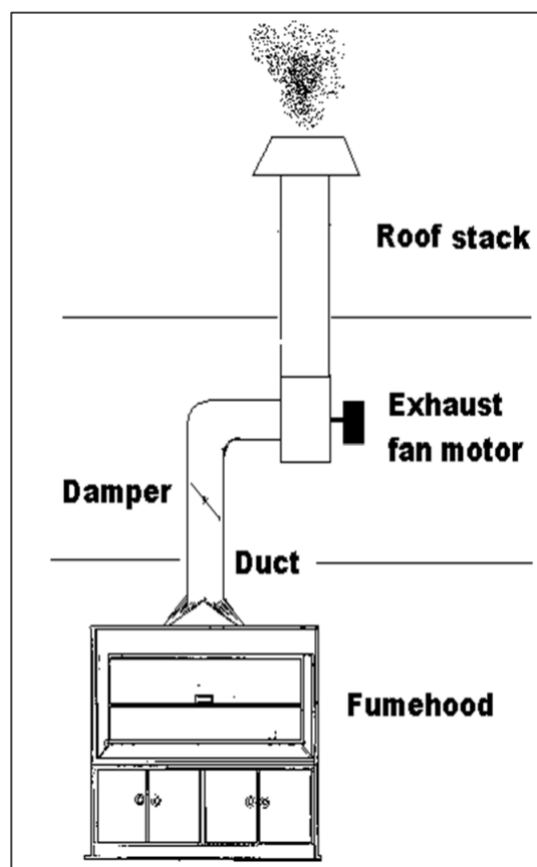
Schematics of a fume hood connected to ductwork that exhausts to the outside of the building.
